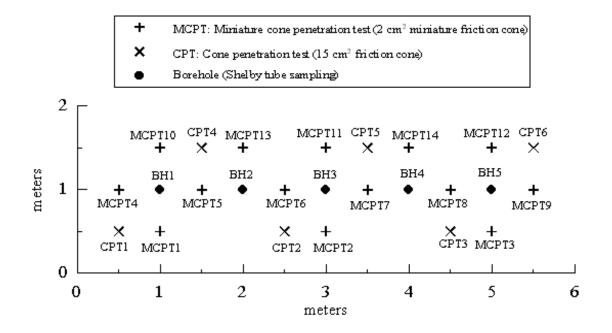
Field testing plan at the (a) I-10 @ Highland Road (LA State Route 42) test site
